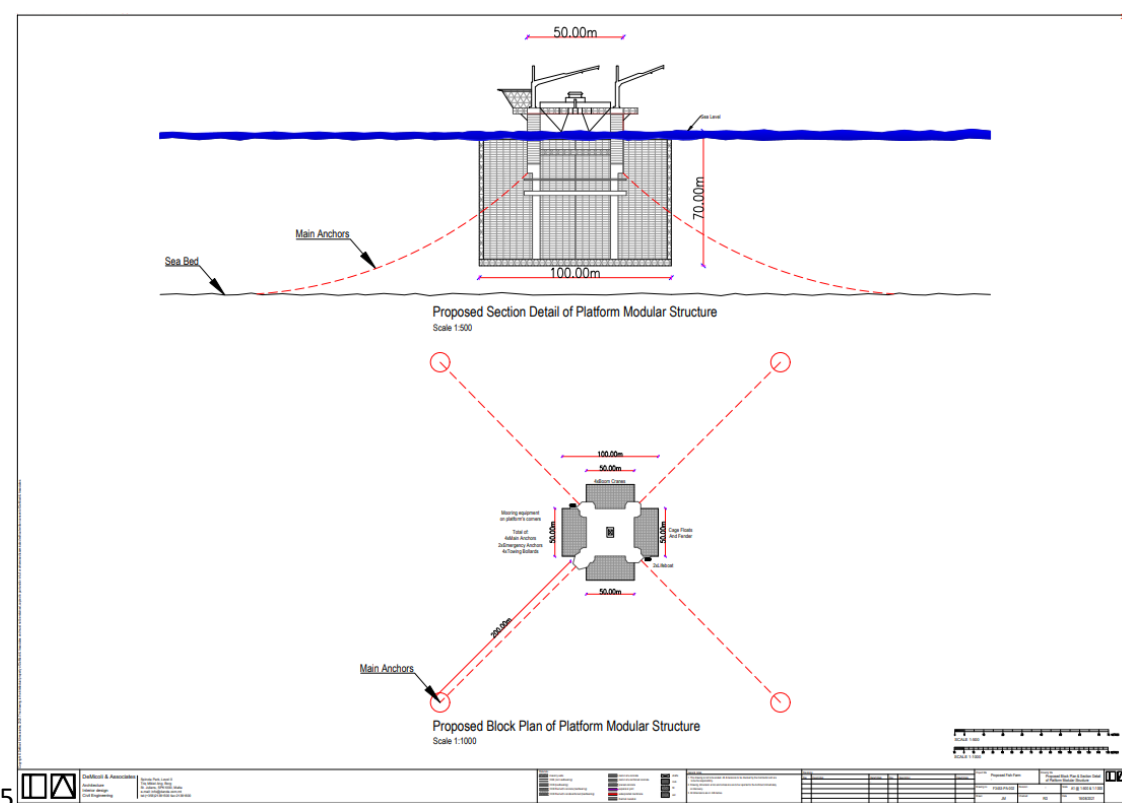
block plan and section details of platform modular structure (Source: PDS)
